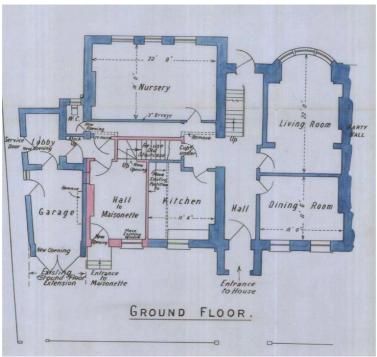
1946 Ground Floor Plan of 7A Subdivision Works
